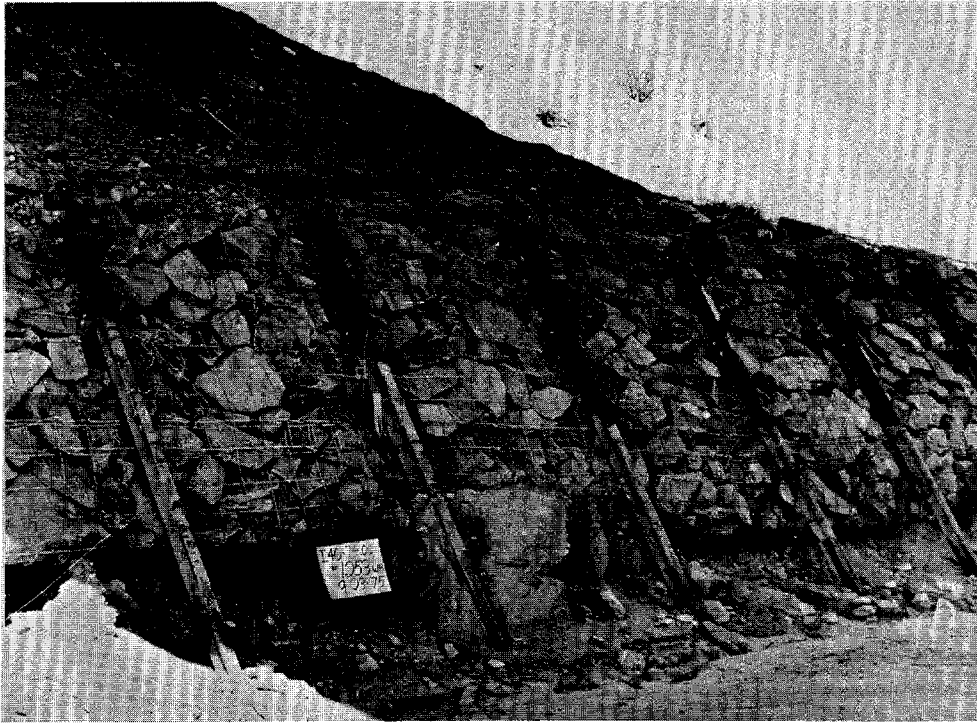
Lateral erosion of railbank (rock-and-wire) protection near upstream left-bank abutment in 1975. (From Arizona Dept. of Highways.)
